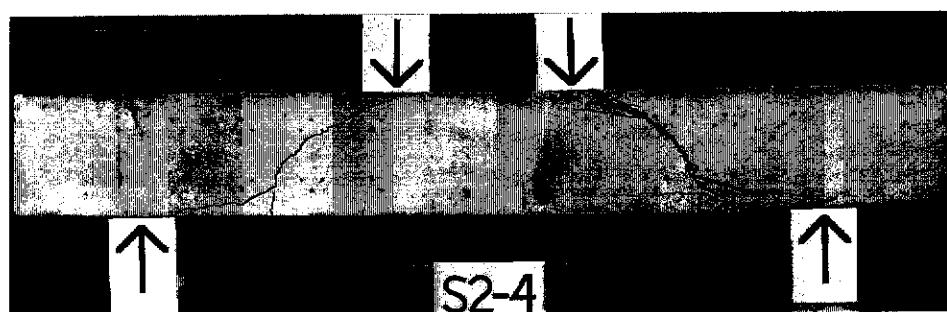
Crack Pattern of the Back Face of Beam S2-4
